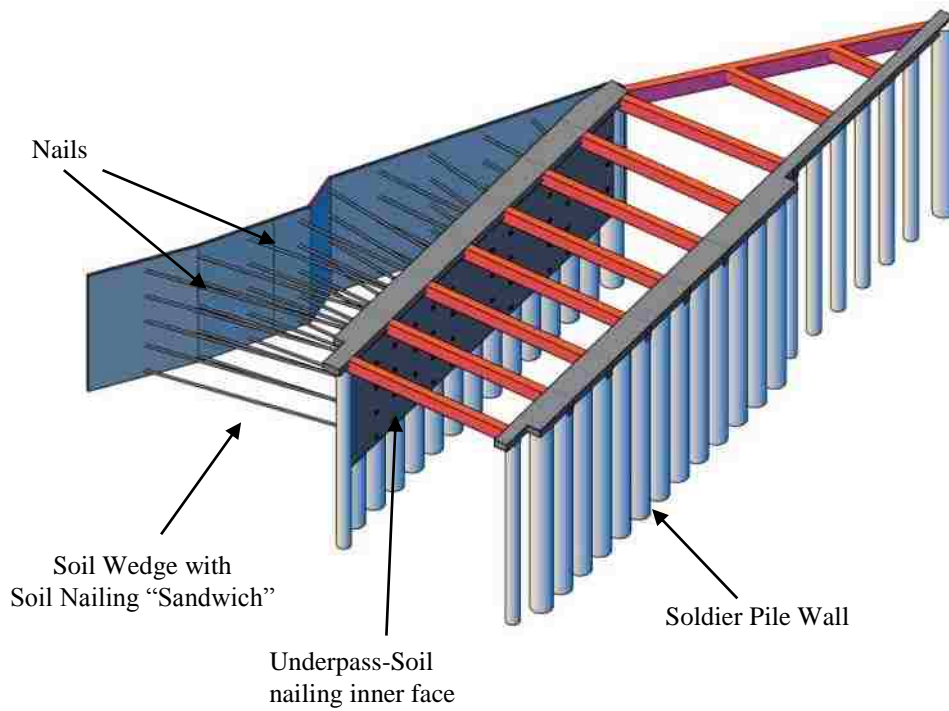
3D model of underpass and soil nail wall reverse view
